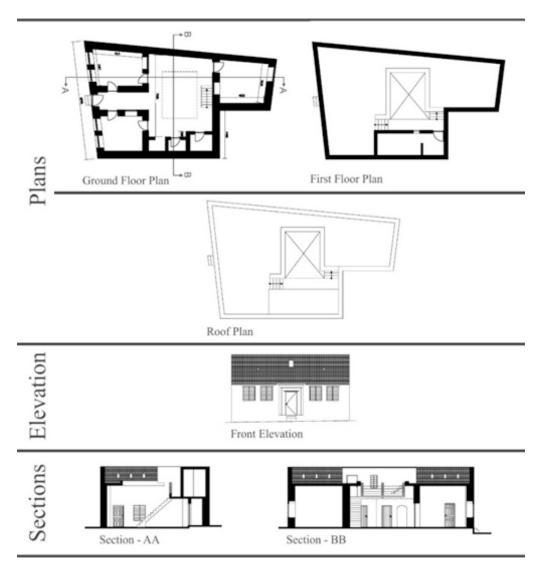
Plans, elevation and sections of house 05. (Abbas, 2015)
